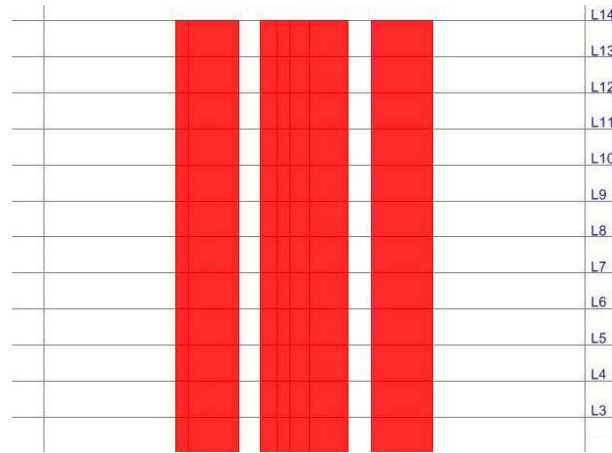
Uncoupled direction elevation view spanning L3 to L14
